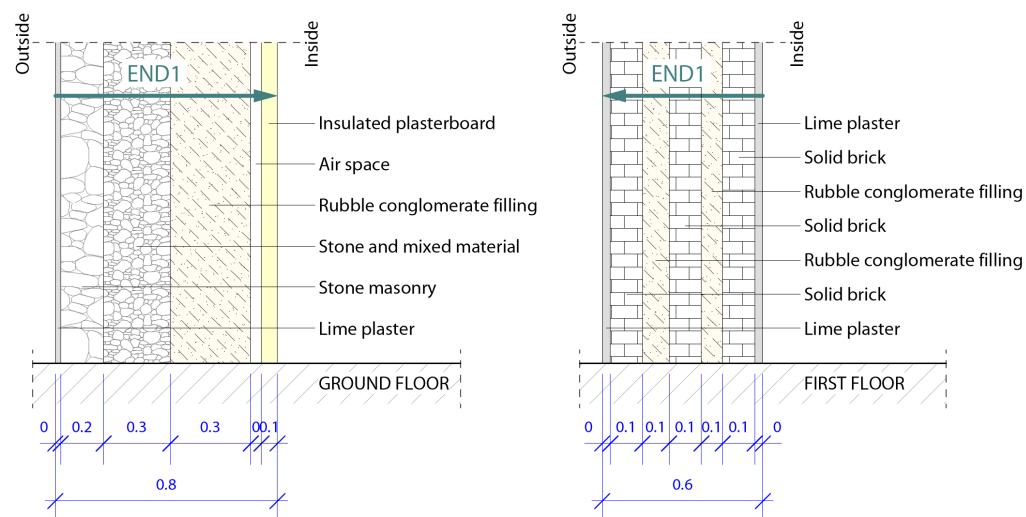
Example of wall characterisation through depth by means of endoscopic tests: stone wall (left) and brick wall (right).
